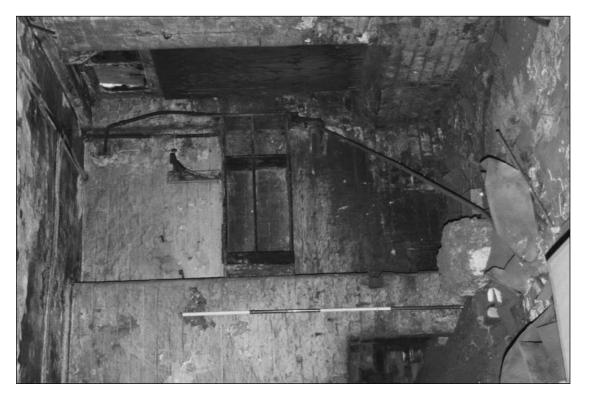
View of northwest corner of F7 showing shelving and cast iron bracket (film 27.35)
